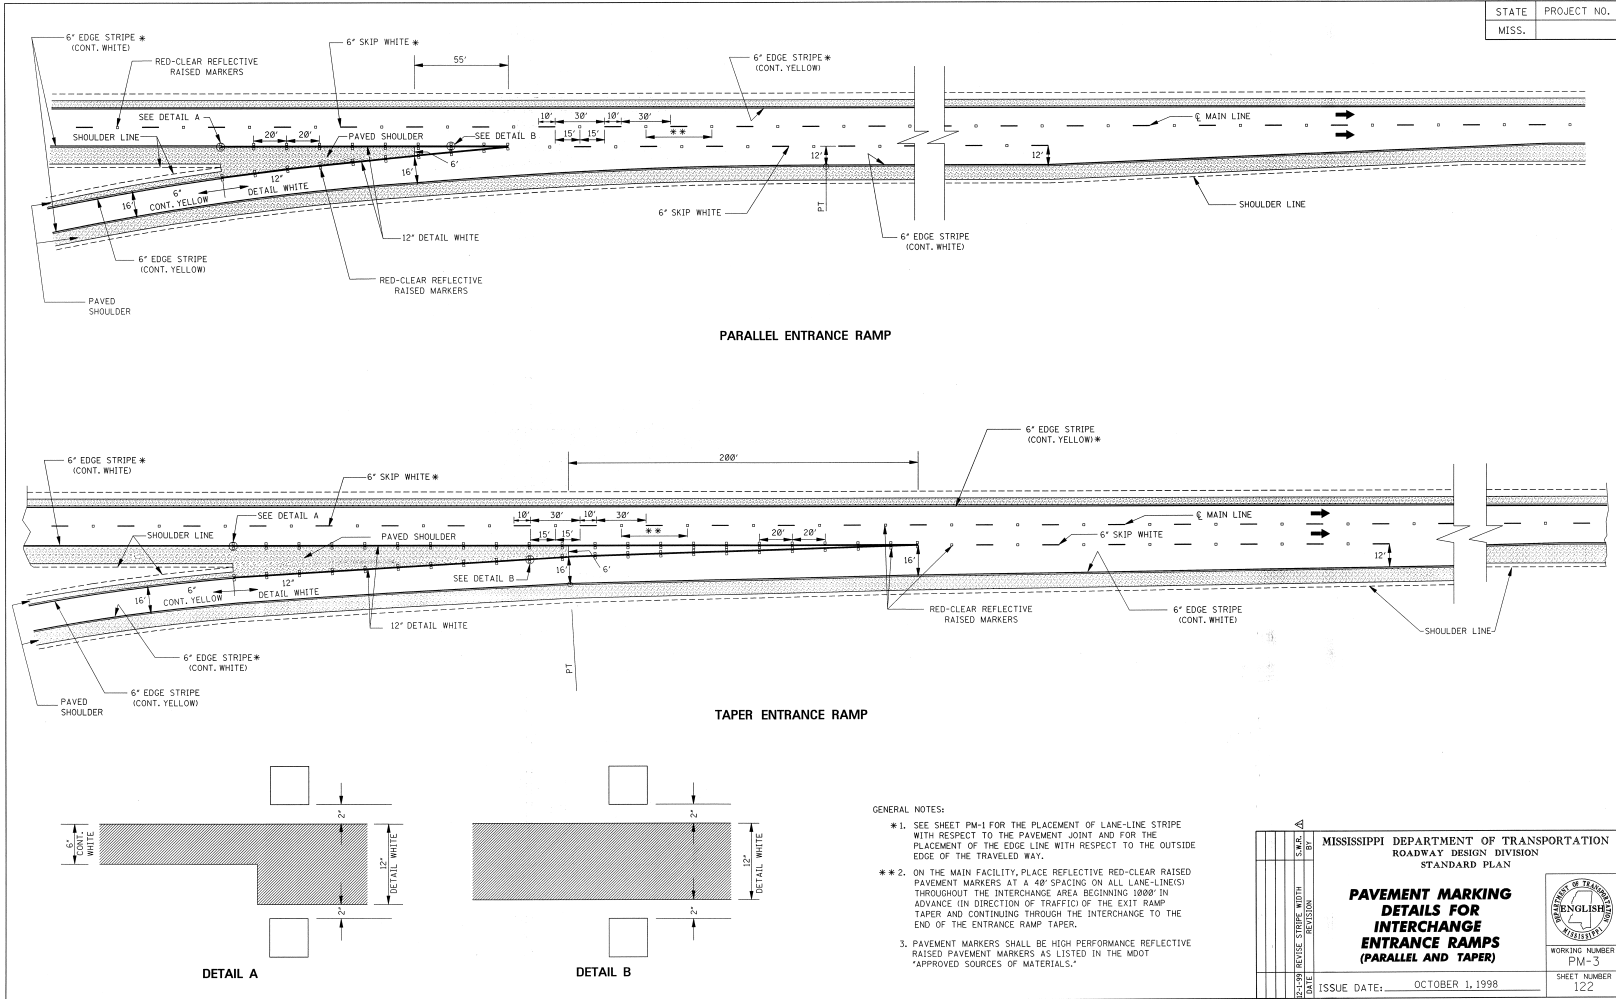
DETAIL B LATERAL PLACEMENT OF PAVEMENT MARKERS
